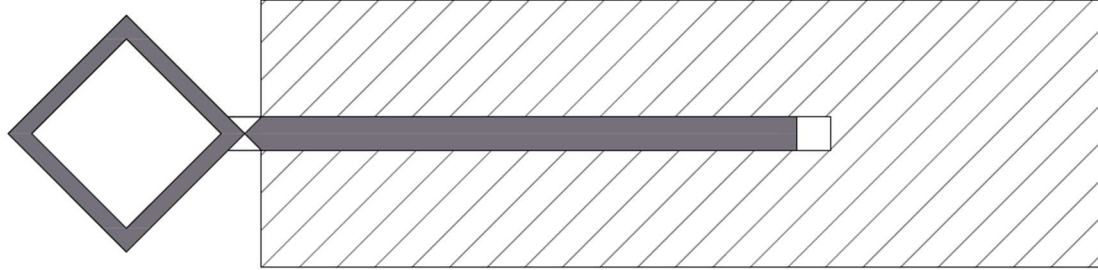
Top view of the proposed connection detail showing the RHS node, welded knife plate and timber beam.
